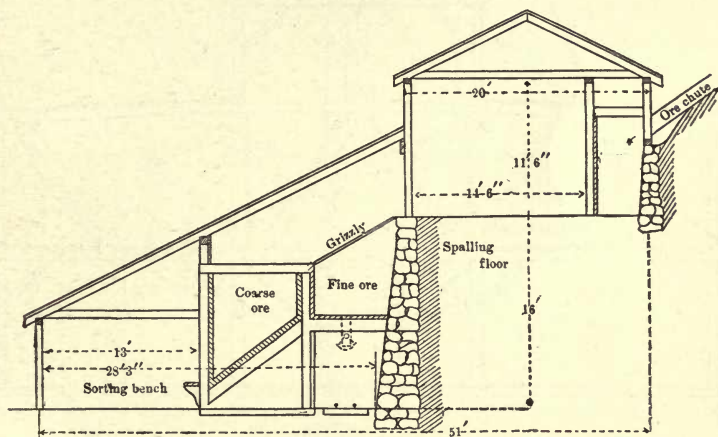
TRANSVERSE SECTION OF SPALLING AND SORTING HOUSE.
